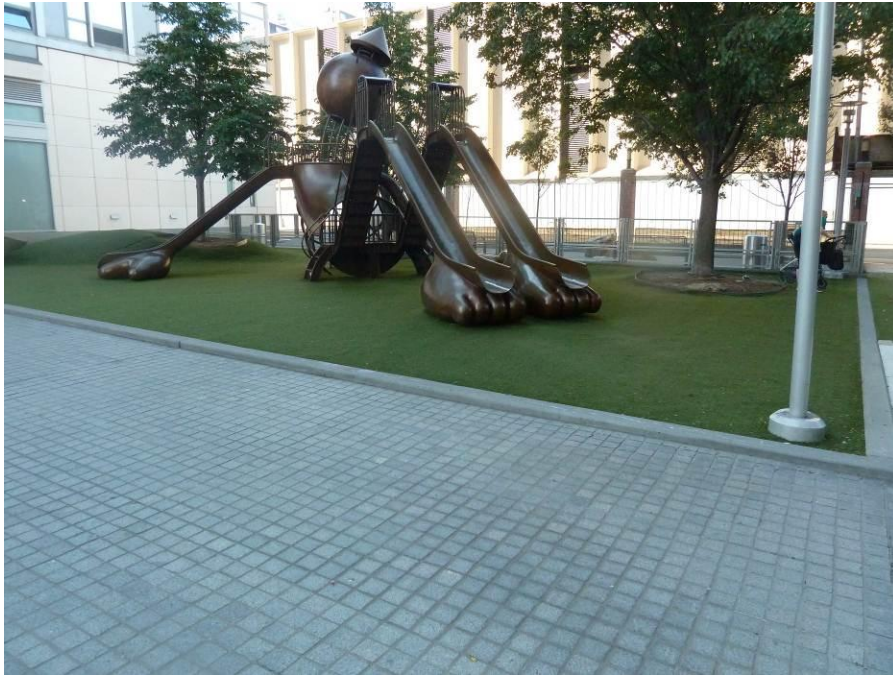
View of paved walkway area located between River Place I and River Place II on West 42<sup>nd</sup> Street.
